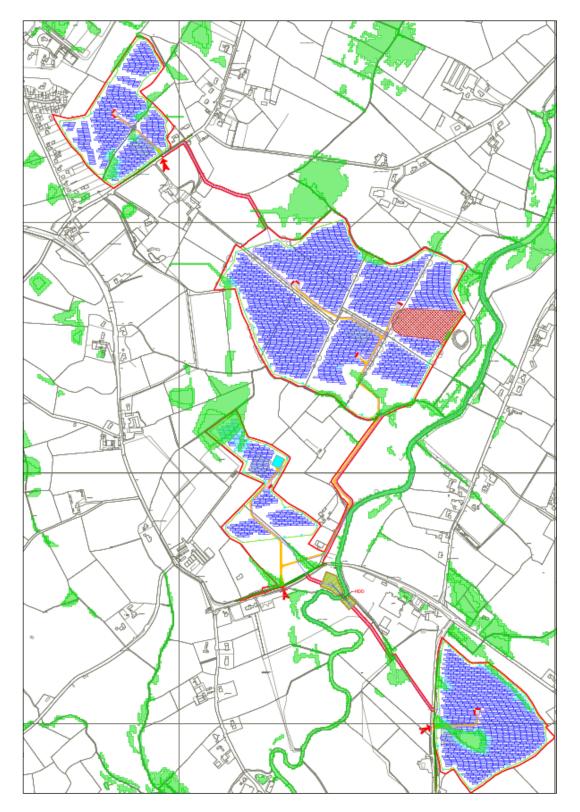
Proposed layout and 0.5% AEP surface water floodplain (2080)
